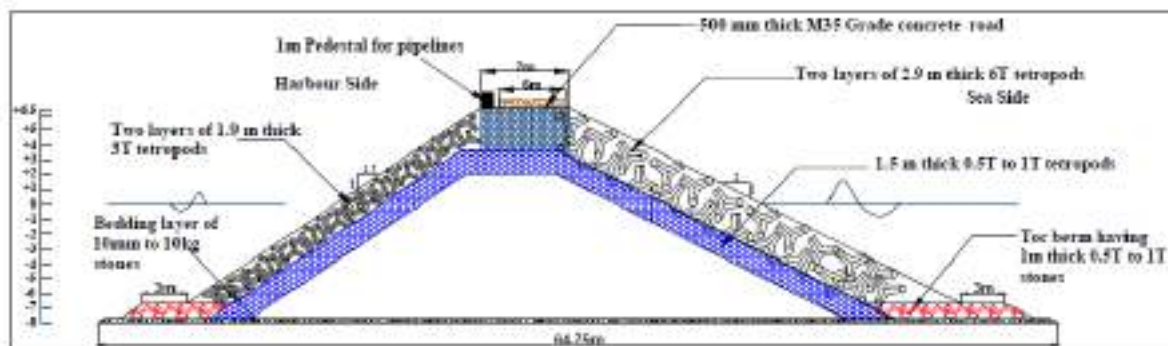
Typical breakwater trunk section for water depth of 5m to 8m
